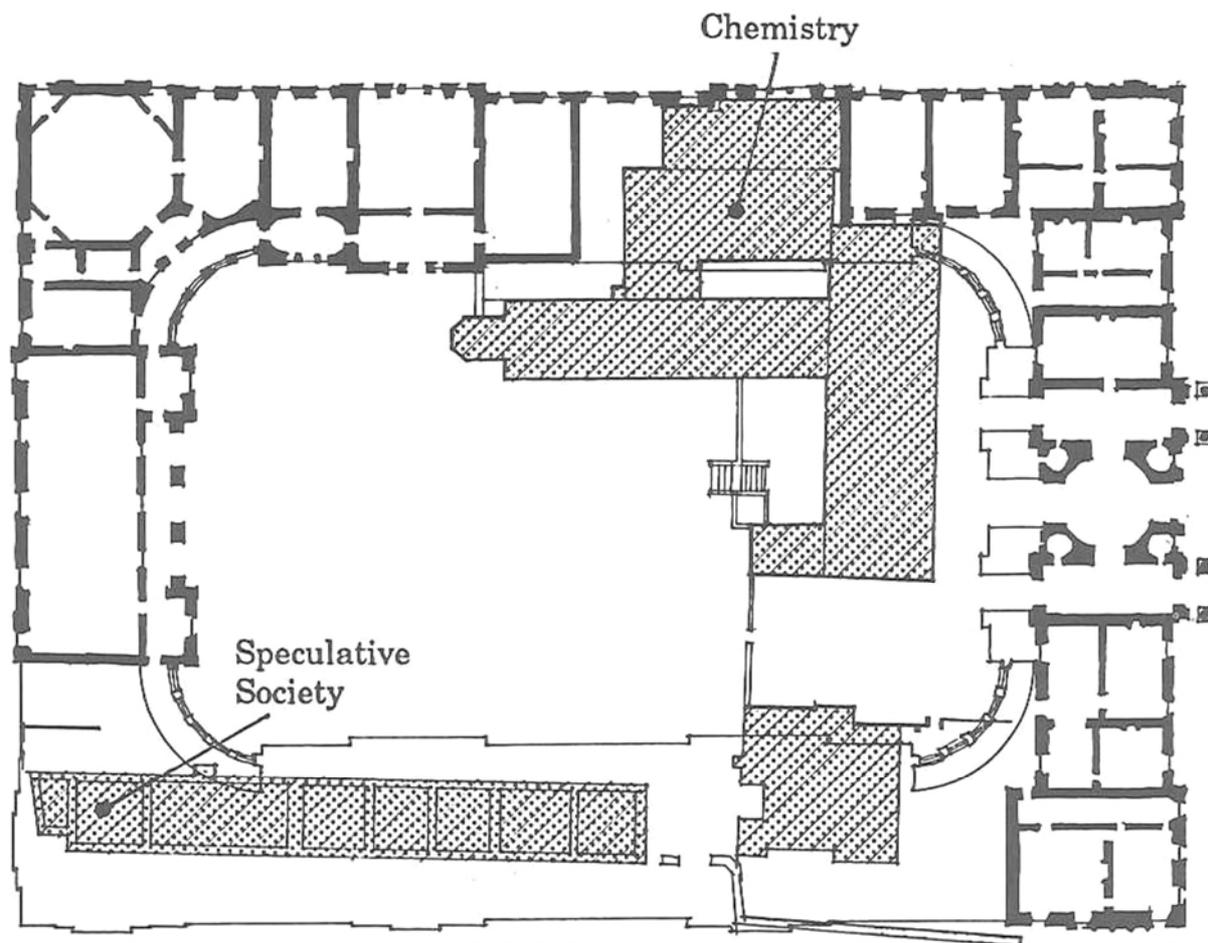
Diagram of Playfair's plan of the existing and projected buildings in 1818. Fraser 1989, 45.
